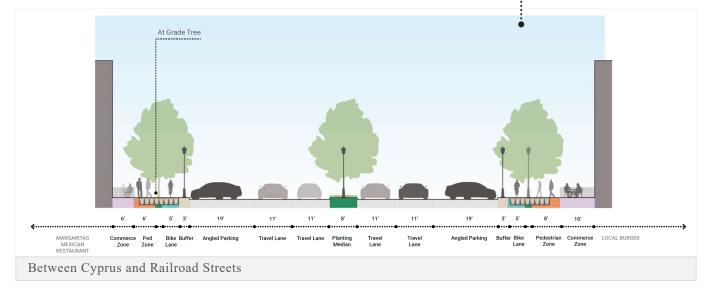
B: PROPOSED CORRIDOR SECTION ON MAIN STREET
